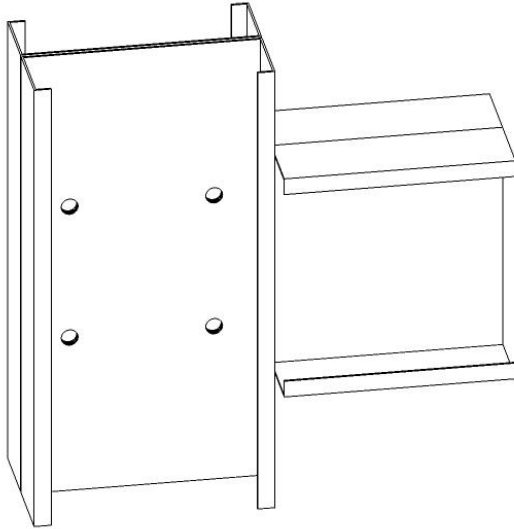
Bracketless beam-to-column joint after Tahir and Siang (2008)
